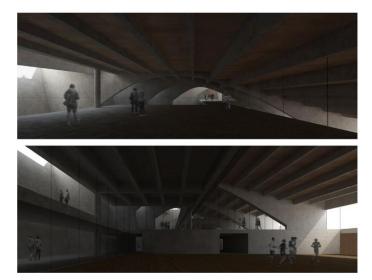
Internal view of the concrete basement: the gym at level -2 (bottom) and other spaces at level -1, under the conference hall (upper)
